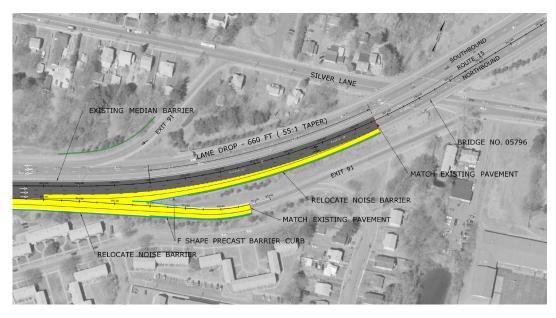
Proposal P4A eliminates the widening of Bridge No. 05796 – Route 15 over Silver Lane and reduces the amount of recently reconstructed Noise Barrier.
